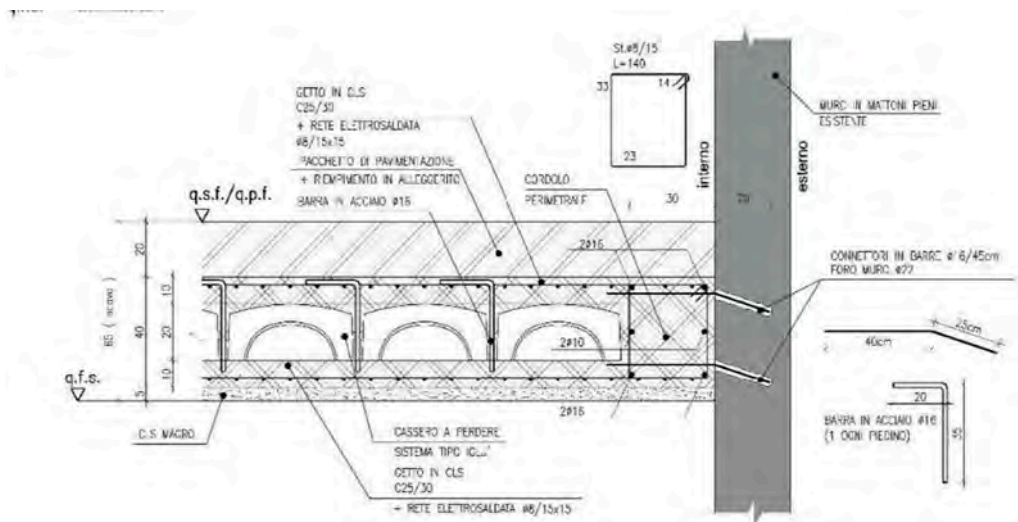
Structural crawl spaces with reinforced concrete slabs and disposable formwork in recycled polypropylene were used for the foundations. This solution constitutes a slab of great horizontal and vertical rigidity and limited weight and bulk, and also represents a layer of insulation and ventilation.
